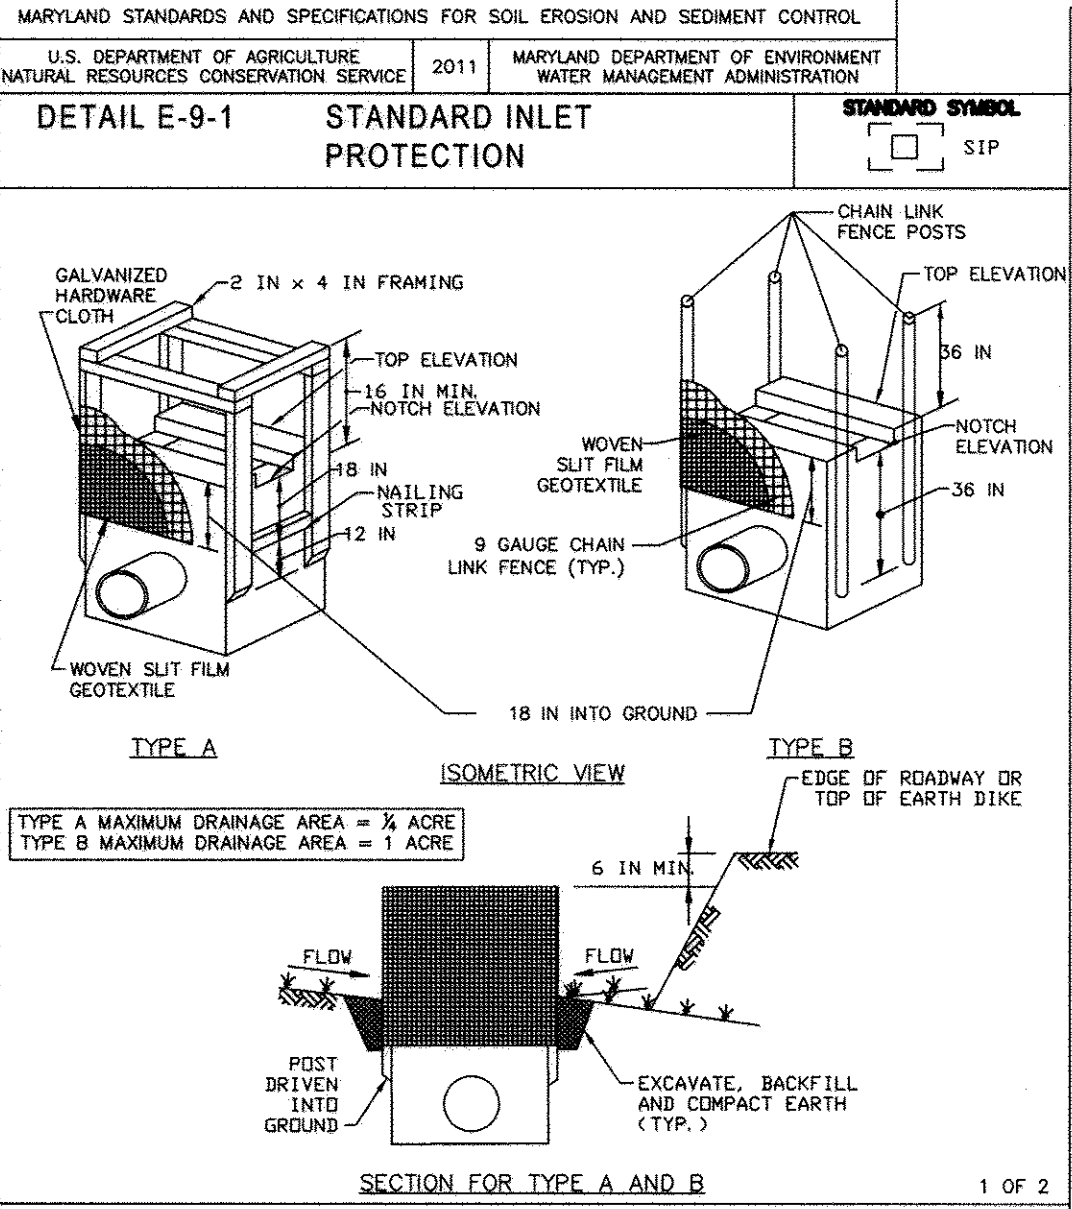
STANDARD INLET PROTECTION
